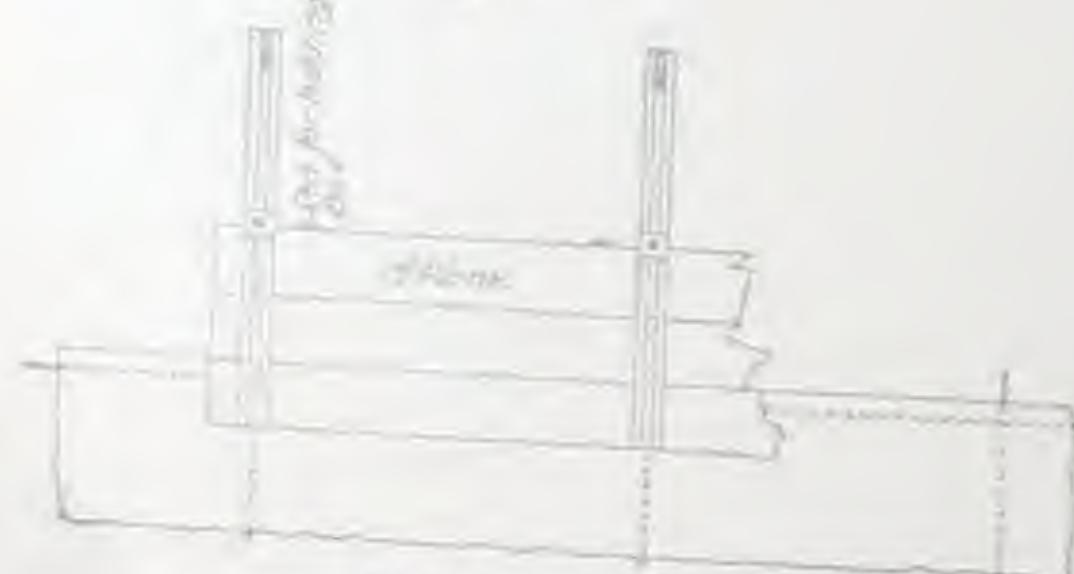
DETAIL OF FORMS FOR HOLLOW WALL CONSTRUCTION, GEDNEY FARMS,
